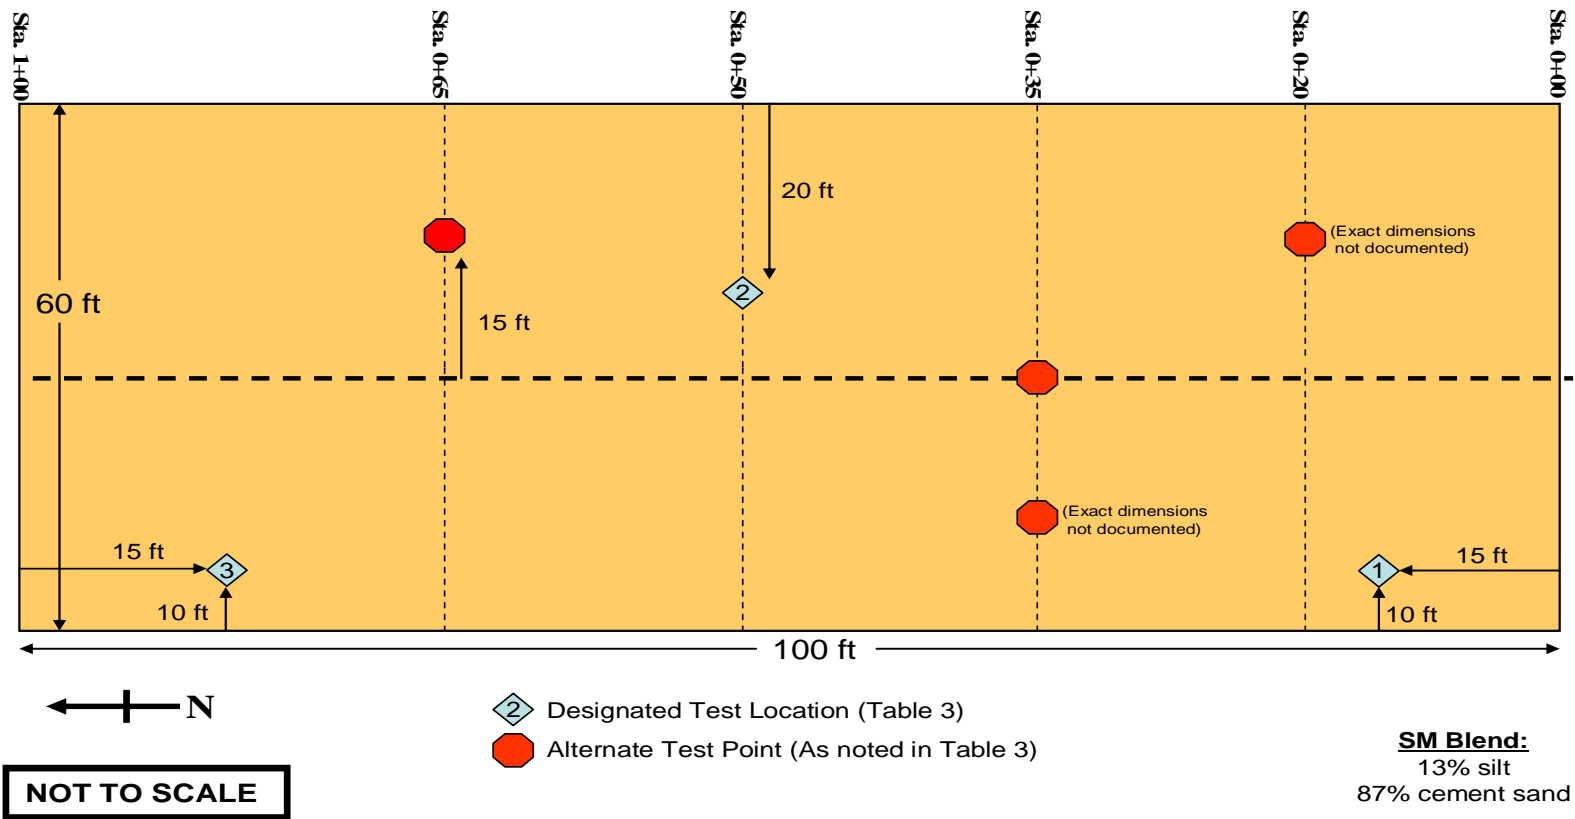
Test Point Locations and Test Section Layout – Medium-Strength Test Section
